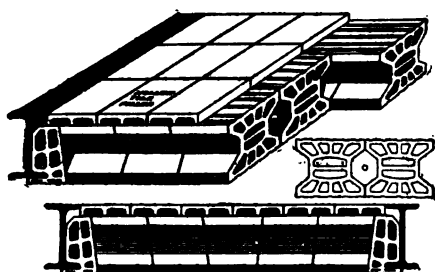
Excelsior End-construction Tile Floor-arch. Side-skew
